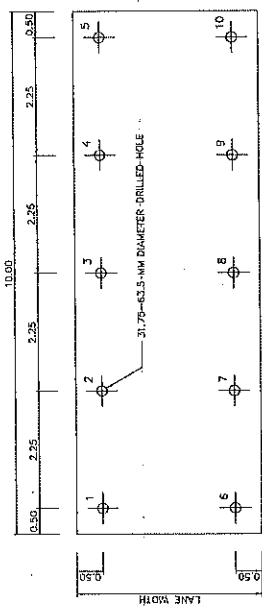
PLAN OF DRILLING FOR CEMENT FOR THE PUMPING JOINT
